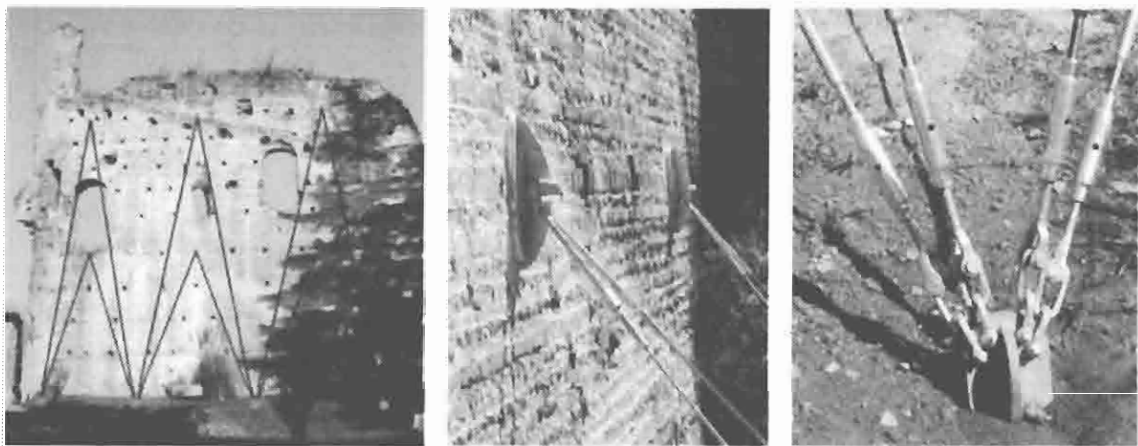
Scheme of the steel cables placement and details of the wall-anchors and the ground- anchors.
